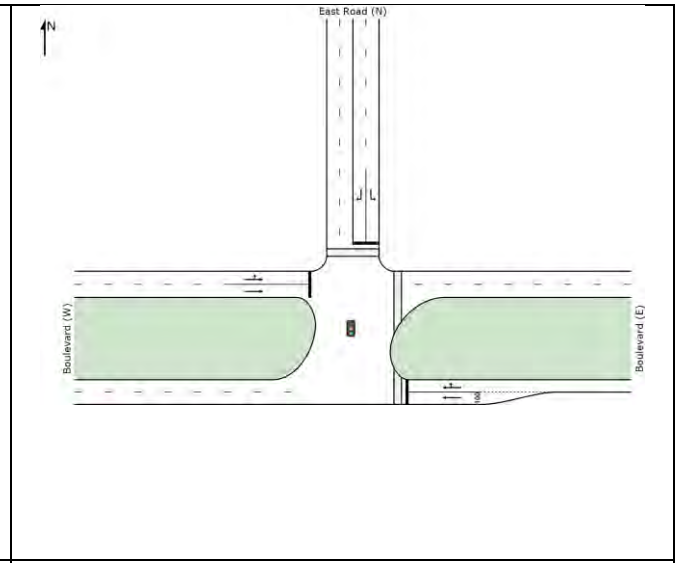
Variant 2c Parkes Way Boulevard – East Road Intersection
